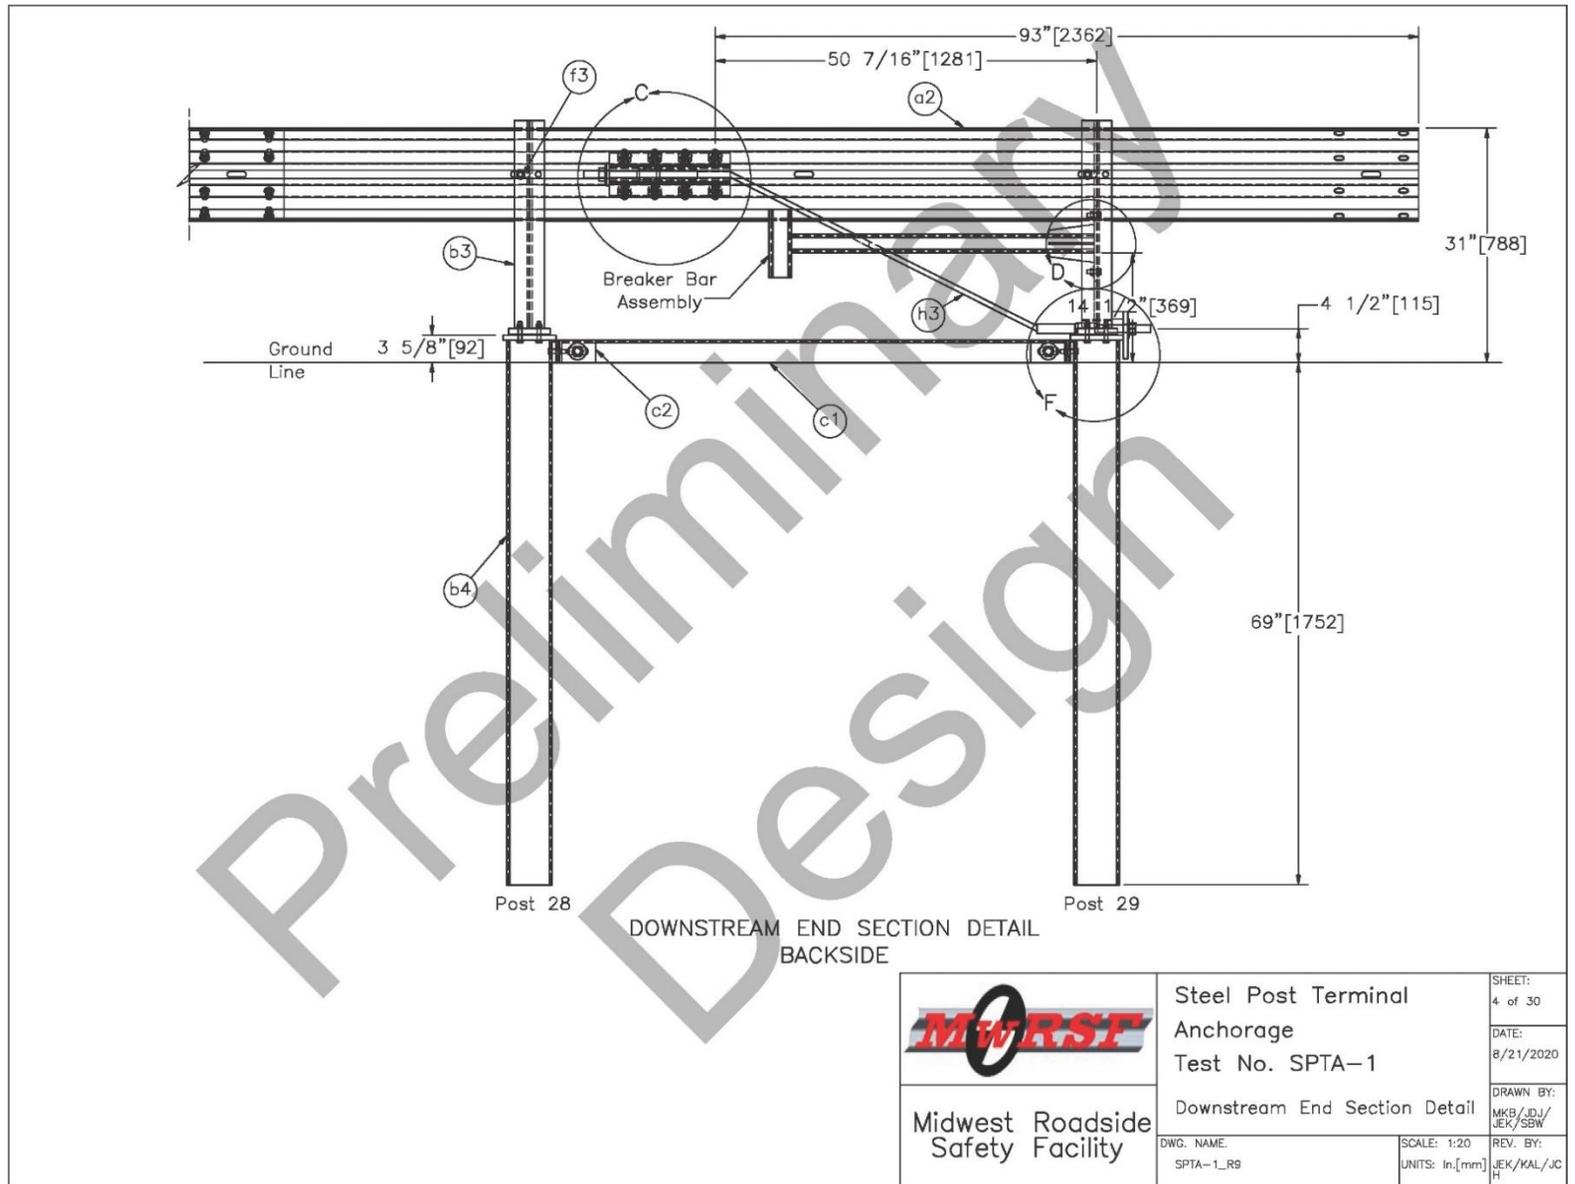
Downstream End Section Detail, Test No. SPTA-1
